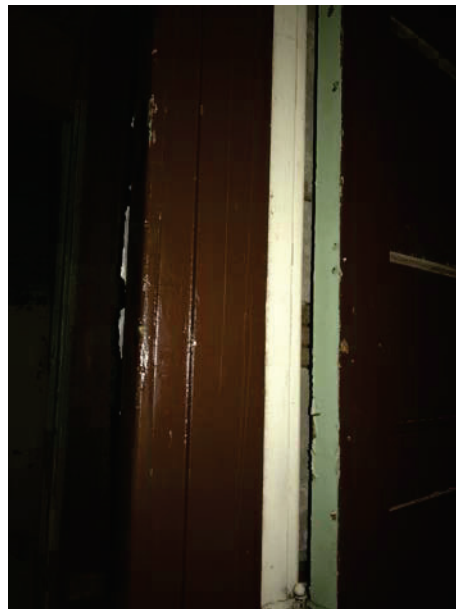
Brown paint on the door casing and the white paint on the door frame and door casing in the front left classroom on the 1st floor.
